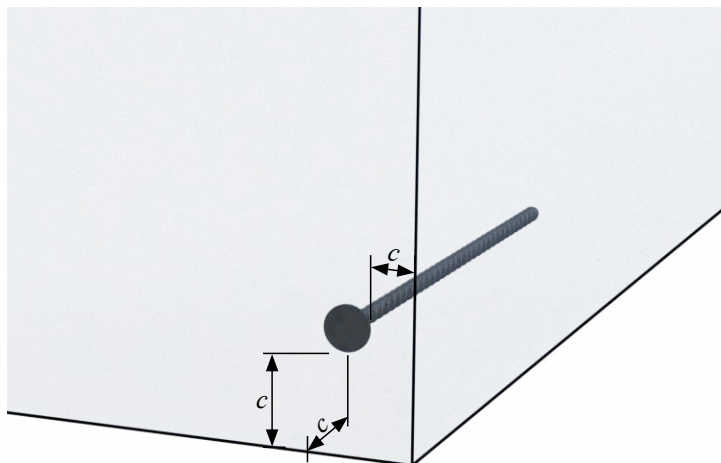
Defined concrete cover of PSB® Headed Anchor.
